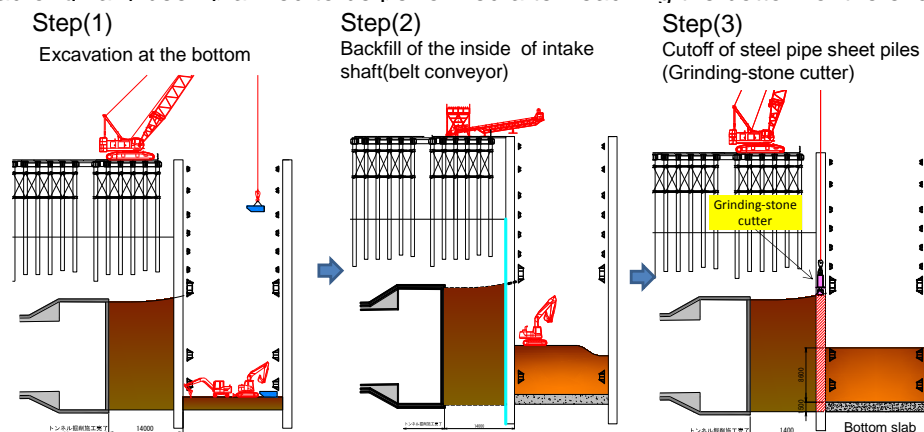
Steps from internal excavation at the shaft to the connecting tunnel breakthrough
